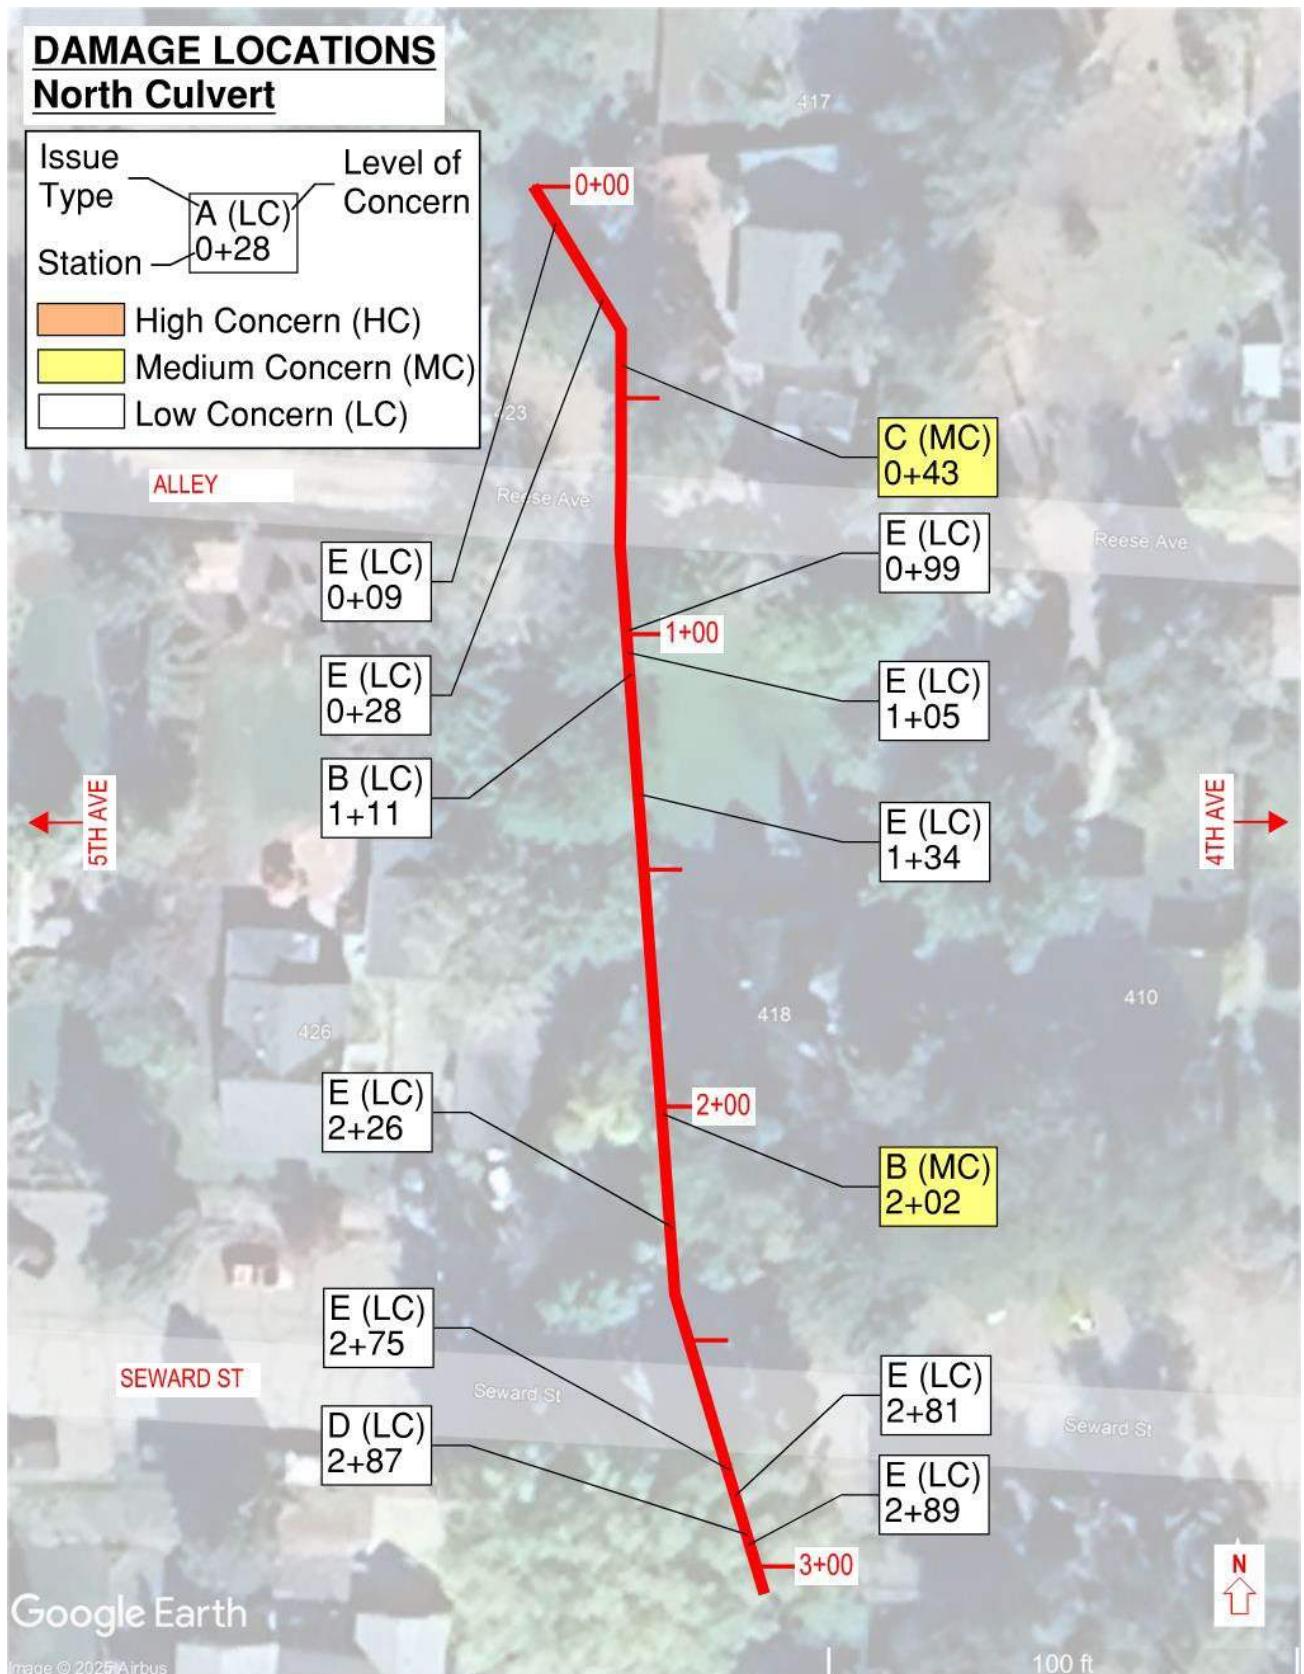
North Culvert Map of Damaged/Deteriorated Areas
